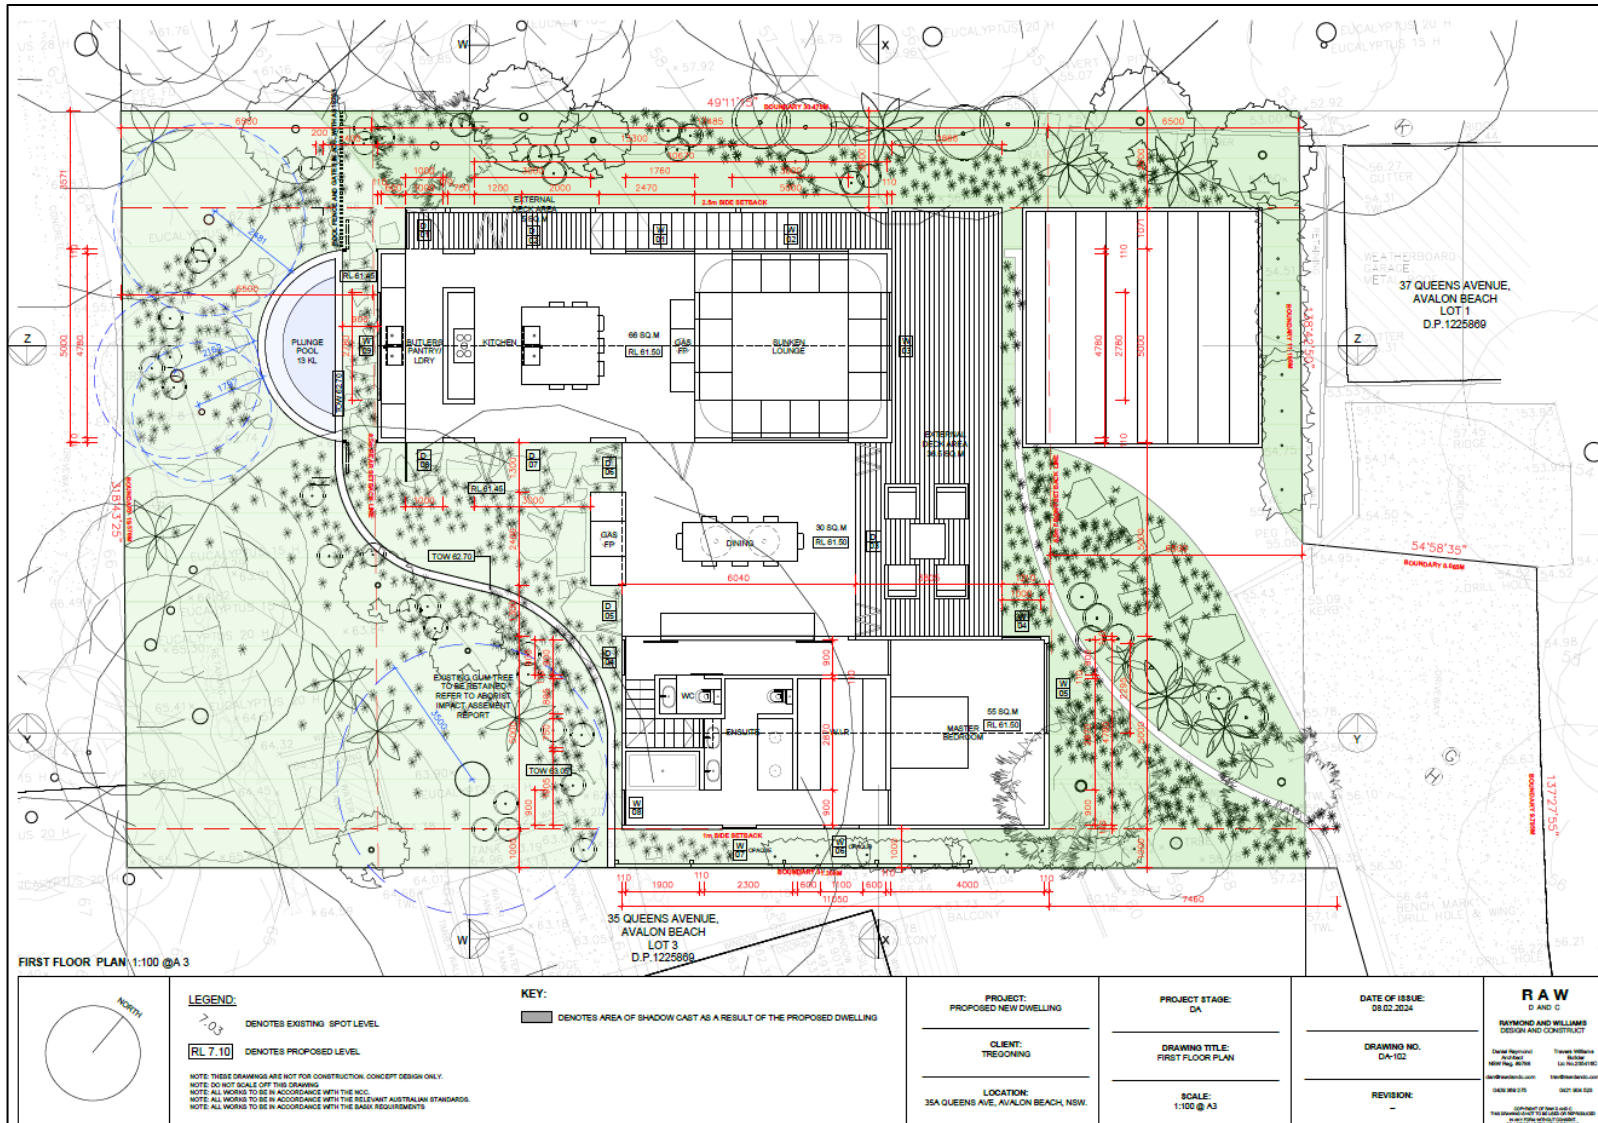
ILLUSTRATES PROPOSED FIRST FLOOR PLAN
